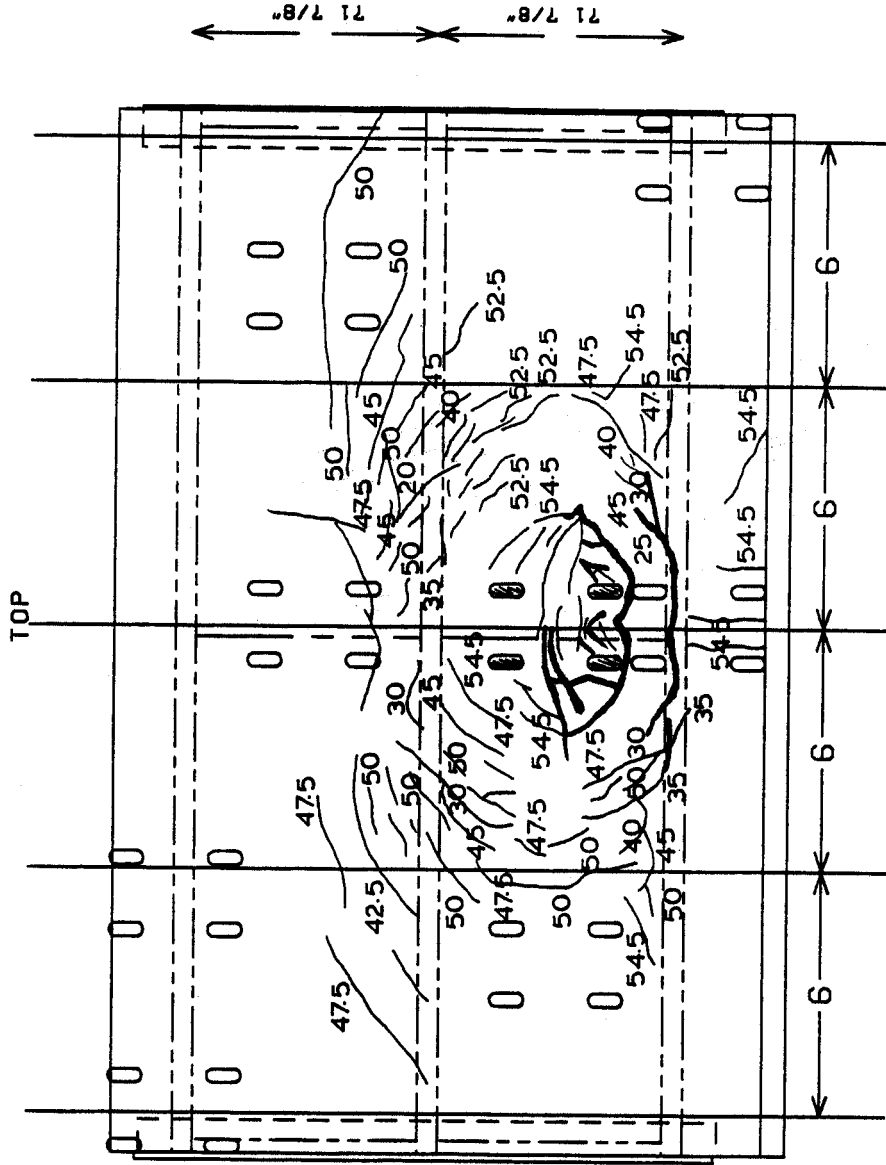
Top Cracking Pattern (Third Bridge - Test No. 3)
